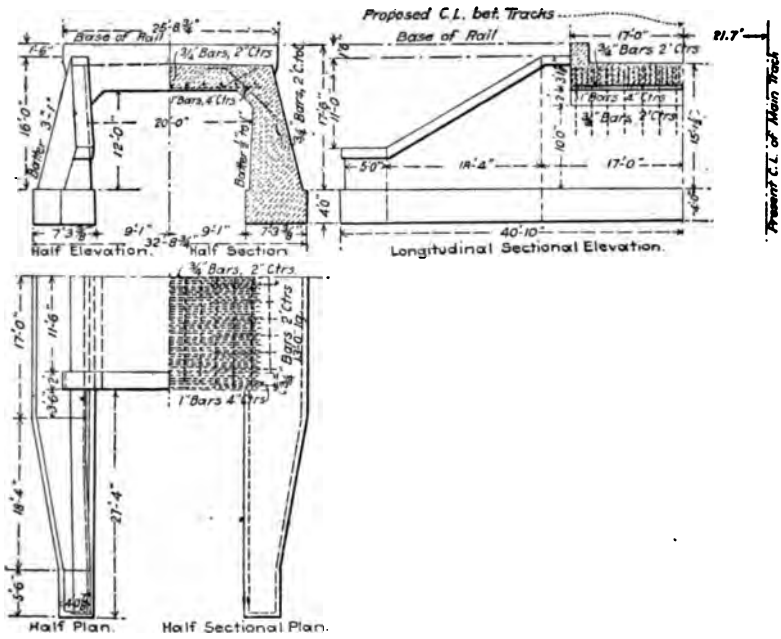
Flat Top Culvert, C., C., C. & St. L. Ry.
